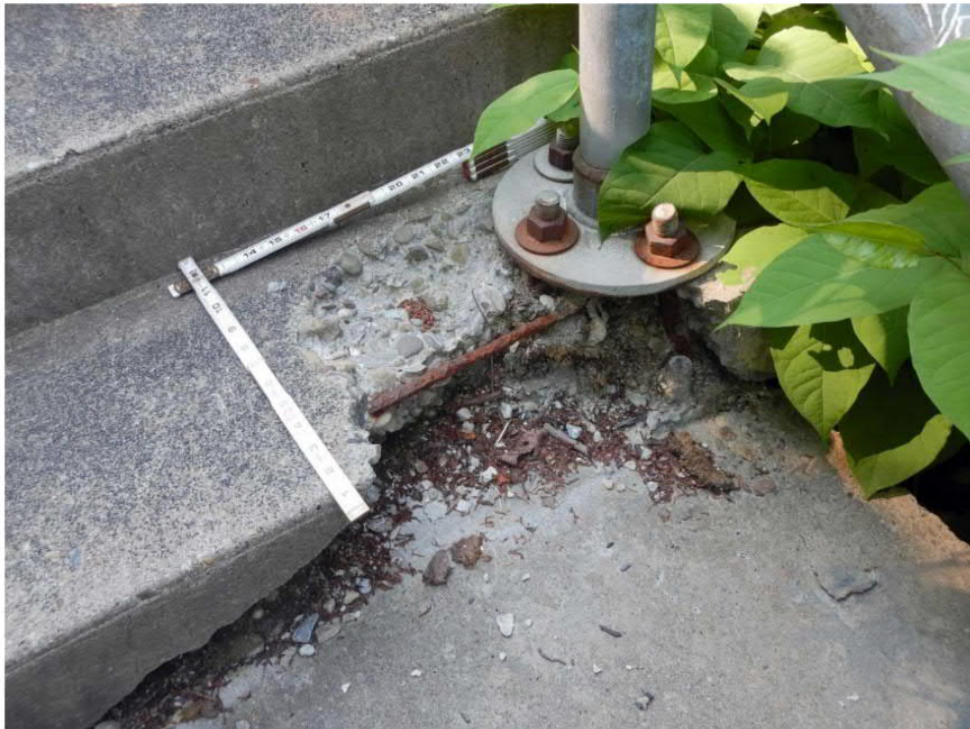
Spalling of a pedestrian stairway with an exposed reinforcement bar poses a tripping and snagging hazard for pedestrians.
